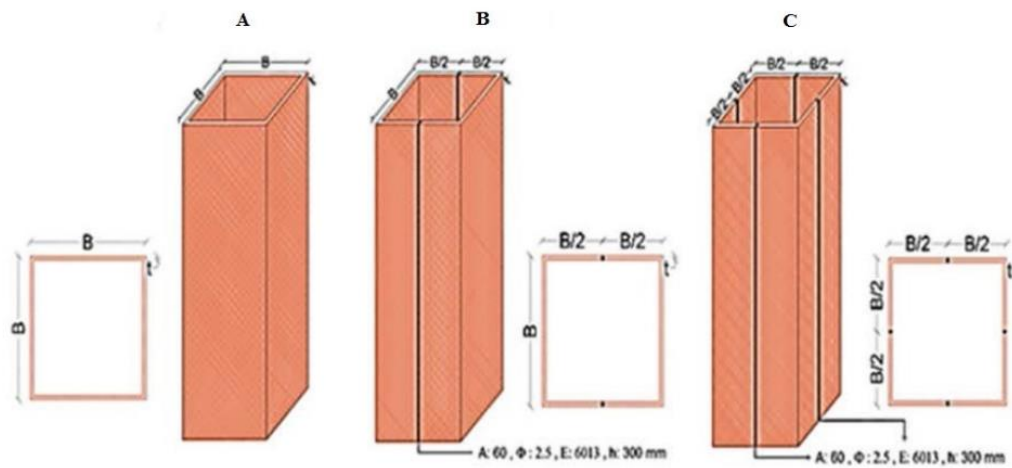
(a) Generic Steel box section, (b) Steel box made by connecting two pieces of cold-formed U-shaped steel plates, and (c) Steel box made by connecting four pieces of cold-formed L-shaped steel plates
